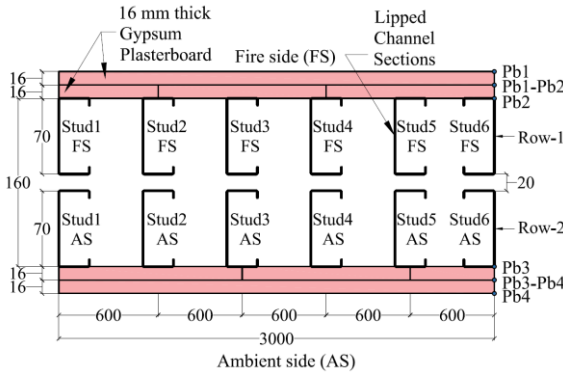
Plan view of full-scale fire Test-T4 [5] considered for numerical model
